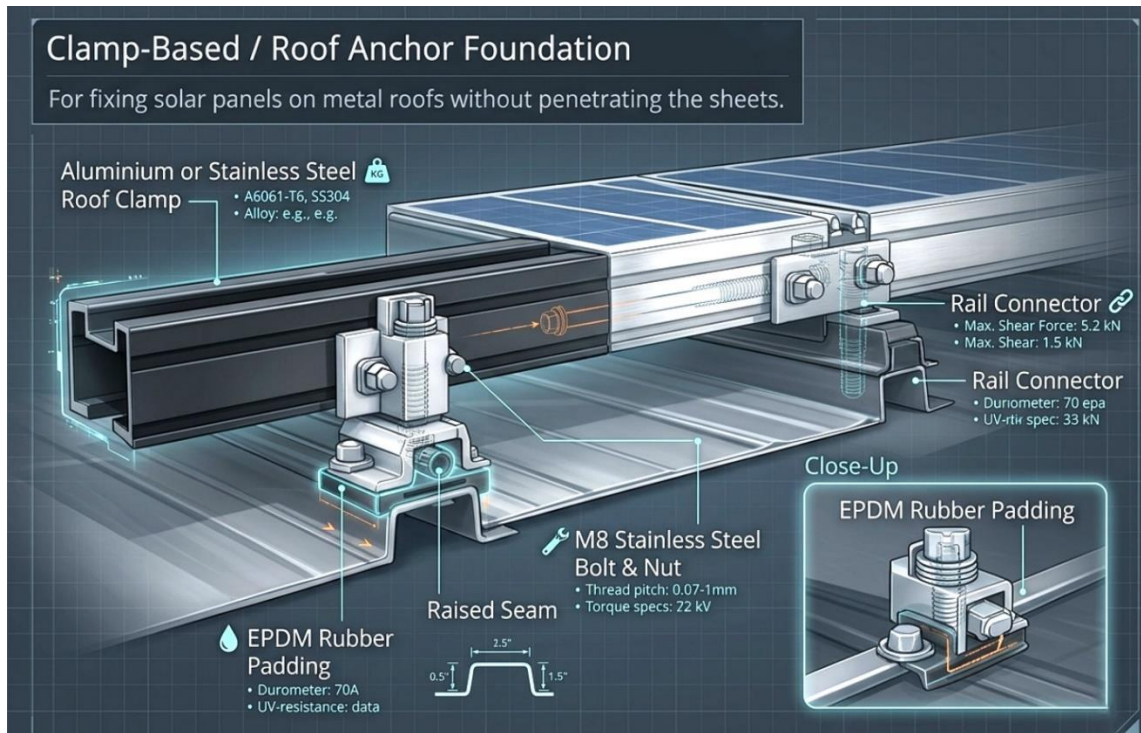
Fixing Solar panels on metal roofs without penetrating the sheets (Clamp based/ Roof Anchor Foundation)
